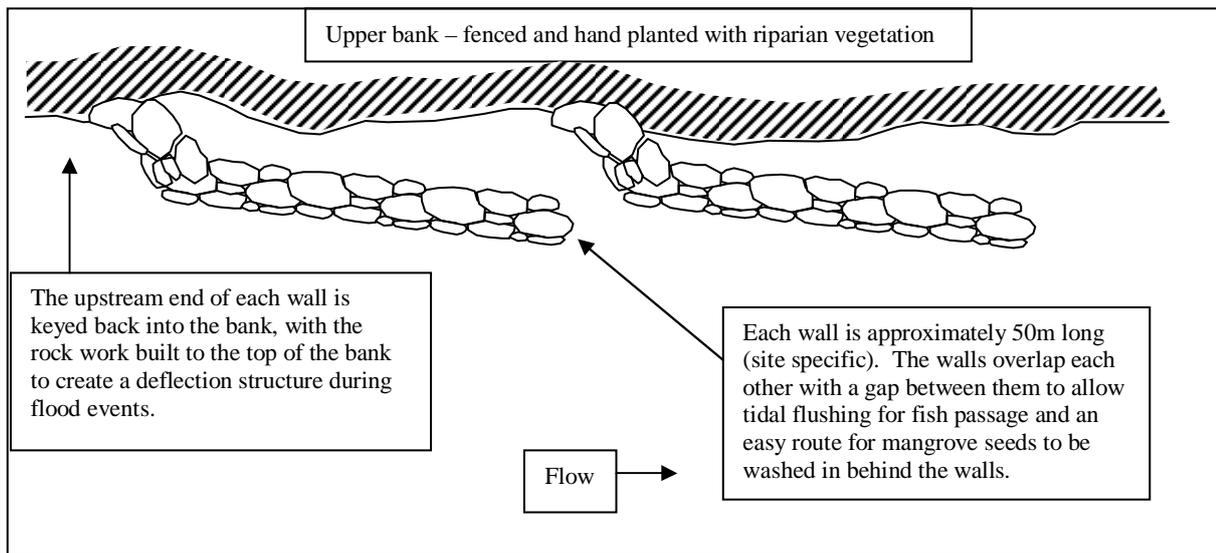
Plan view sketch of typical Rock Fillet wall arrangement.
